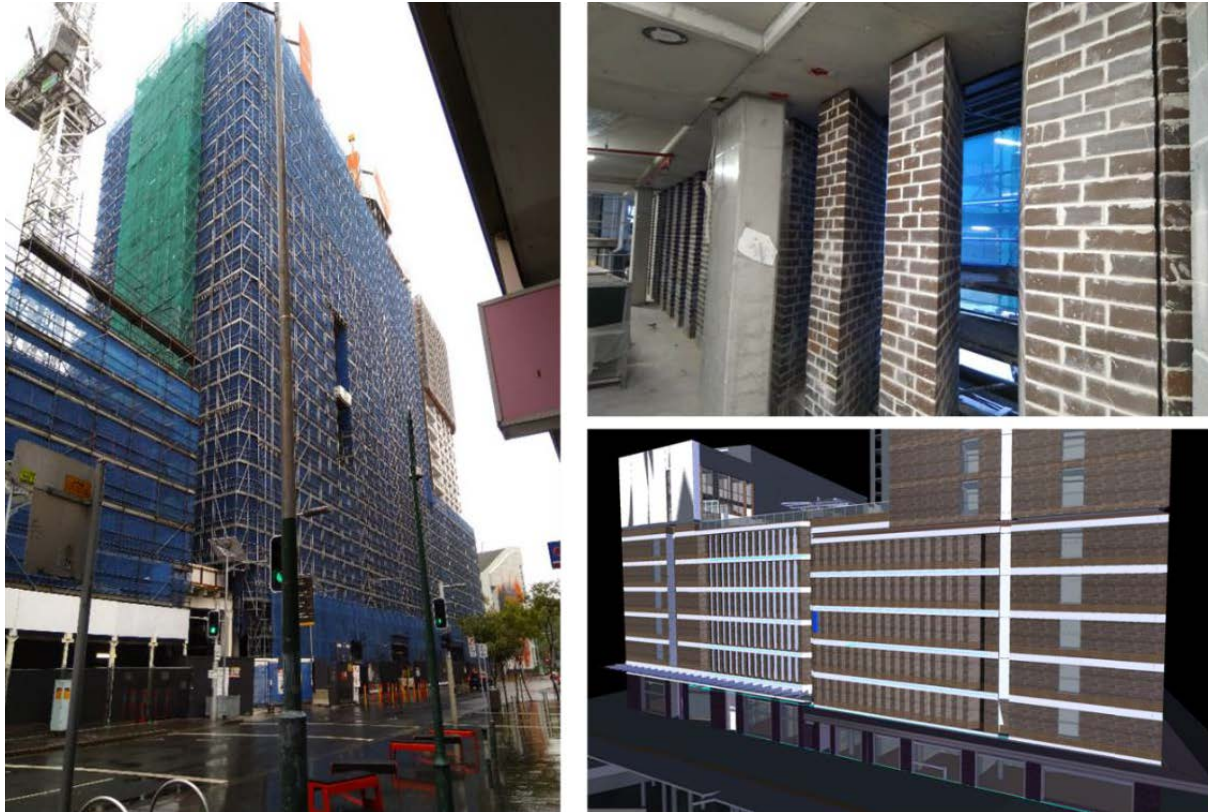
Case KHAKI building and the brickwork face 3D model
